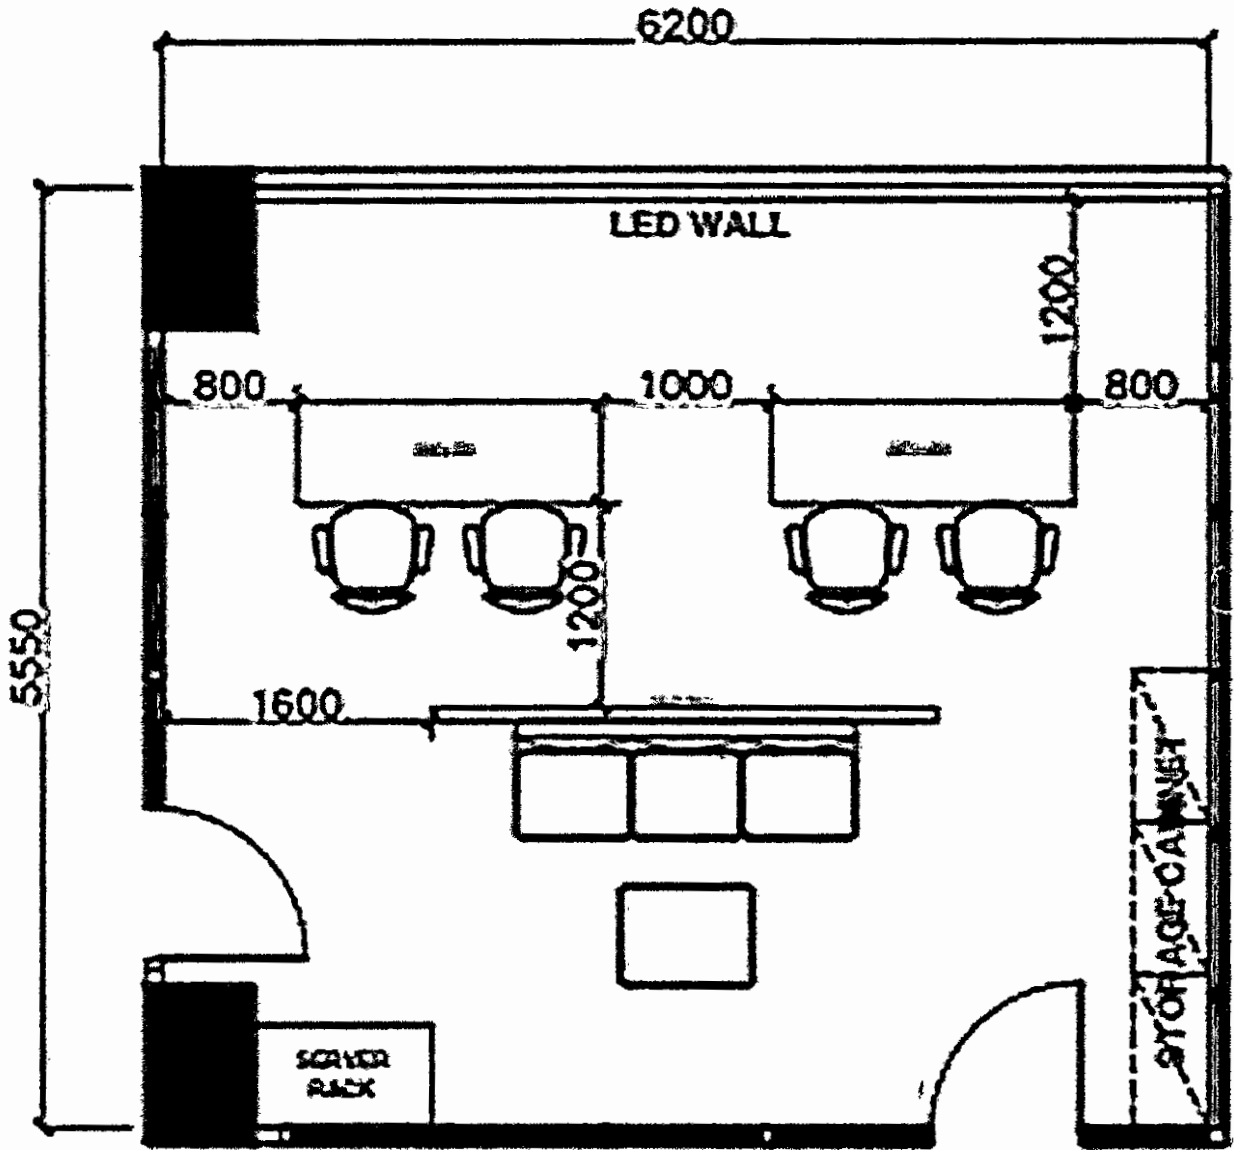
EXHIBIT B - NEA DDCC PROPOSED ROOM LAYOUT
